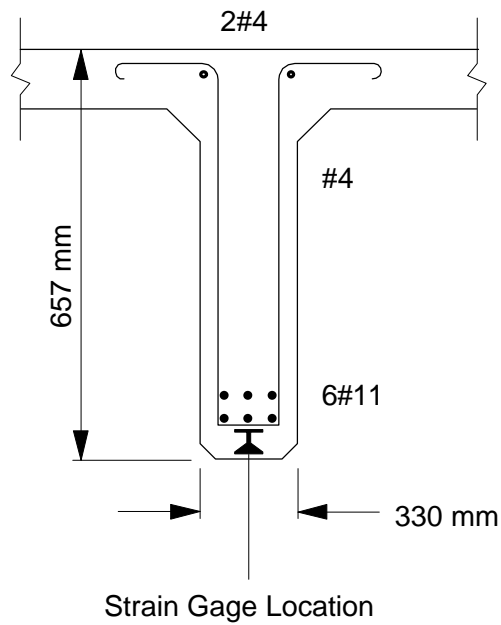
Typical T-Beam Cross Section for Bridge Rehabilitation.
